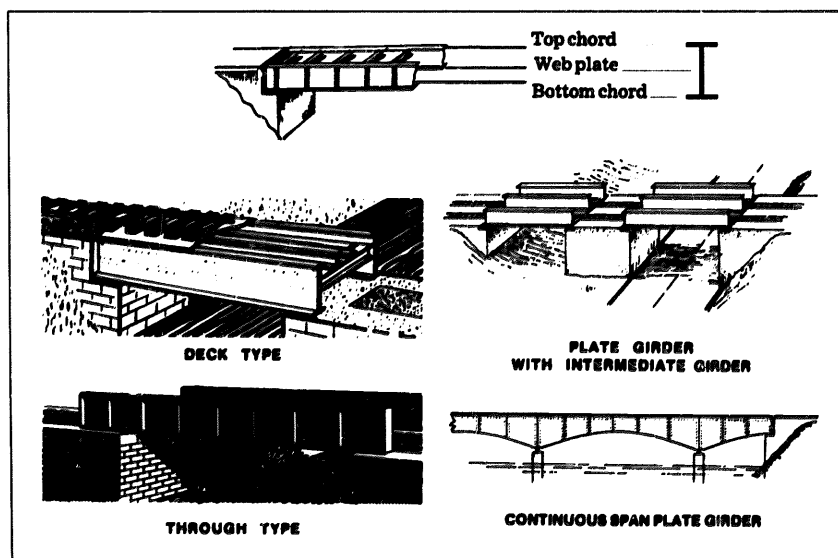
Various configurations of plate girder bridges. Because of their great strength, plate girders are most commonly used on railroad bridges. Note the cantilever design of the last example. When identified by its shadow on vertical imagery, this may be mistaken for an arch bridge.
